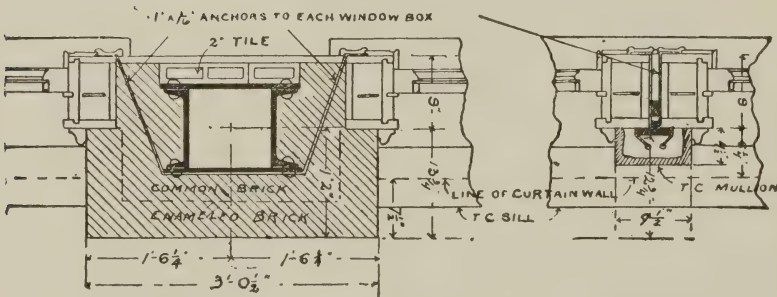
Plan of Piers and Mullions in Alley and Light Court,
